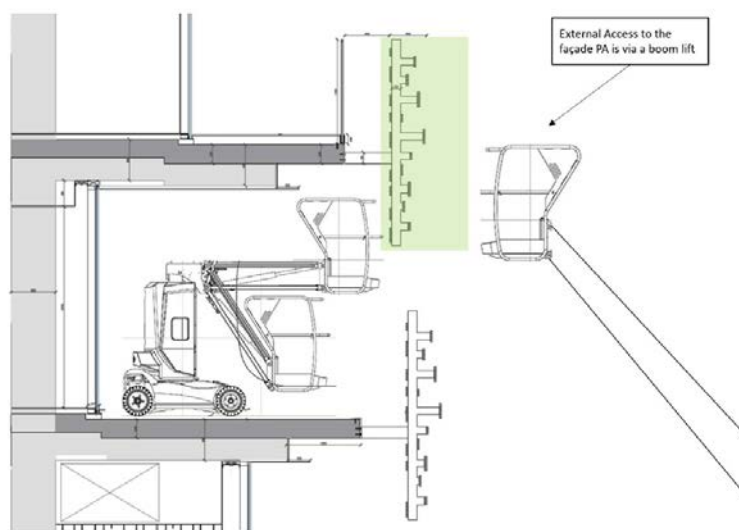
Façade Section view of working at heights using elevated work platforms information included in the Model. Source: Images provided by Alex Scotts, F&D Normoyle Engineering Pty Ltd.
